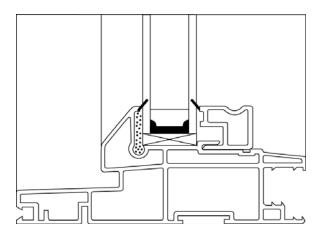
Vertical section through fixed PVC window profile, with non-finned window frame ("box frame")
